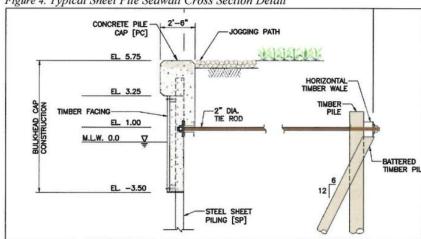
Typical Sheet Pile Seawall Cross Section Detail
